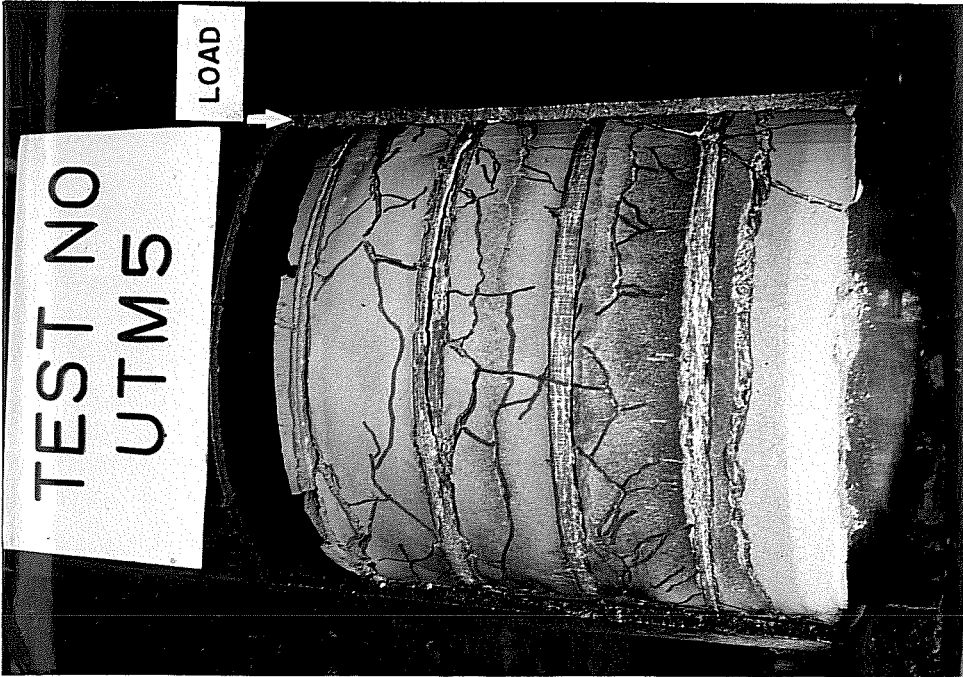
Grout surface on sleeve side for Specimen UTM5
